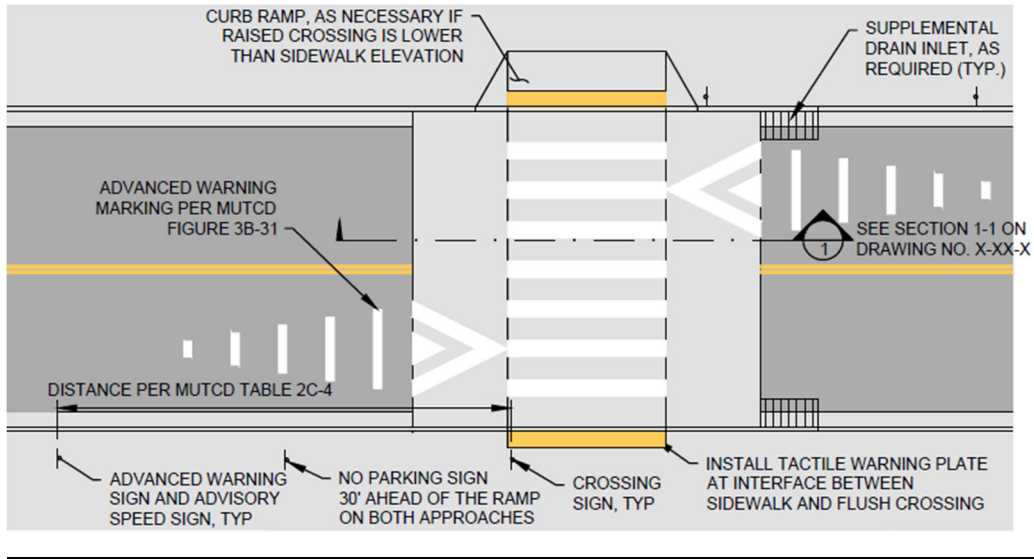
Typical Layout of Raised Crossing at Mid-Block Location
